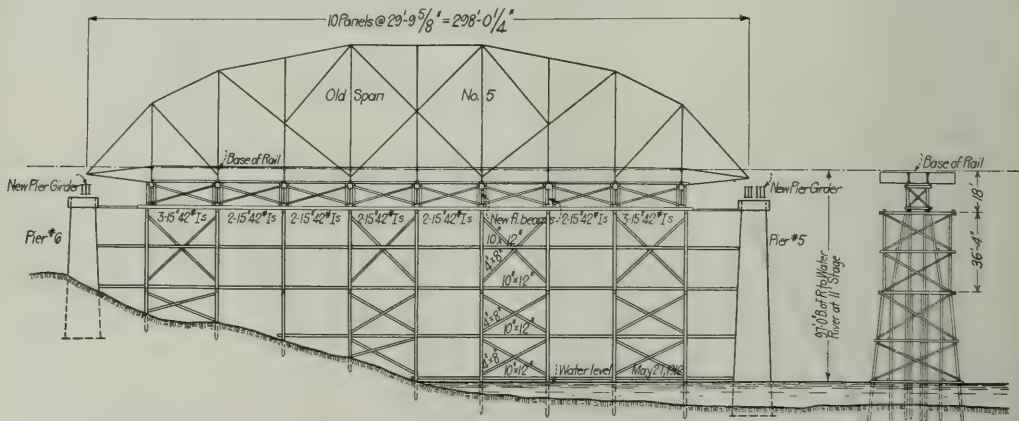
False Work Used in Erecting End Spans Showing Pony Bents Supporting New Floor Beams.
